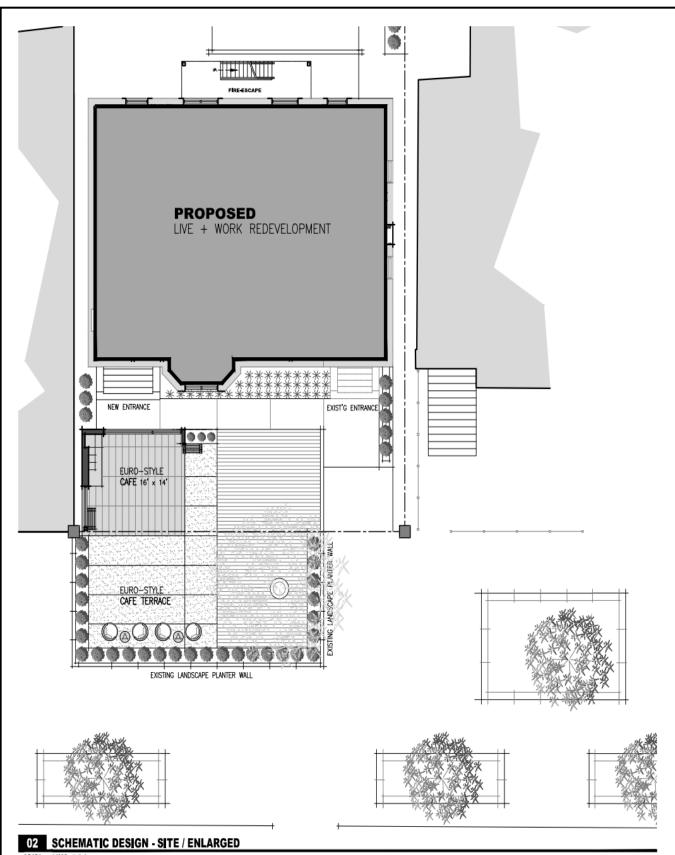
SITE PLAN: BUILDING FOOTPRINT
